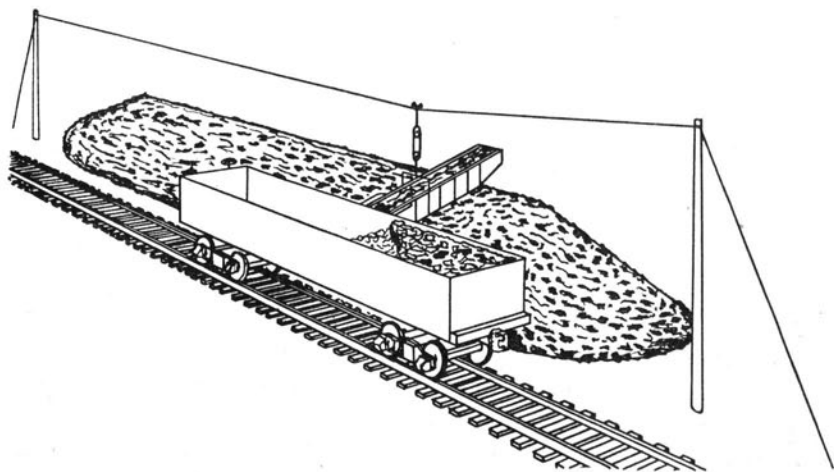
PORTABLE CONVEYOR SUPPORTED BY CABLE
